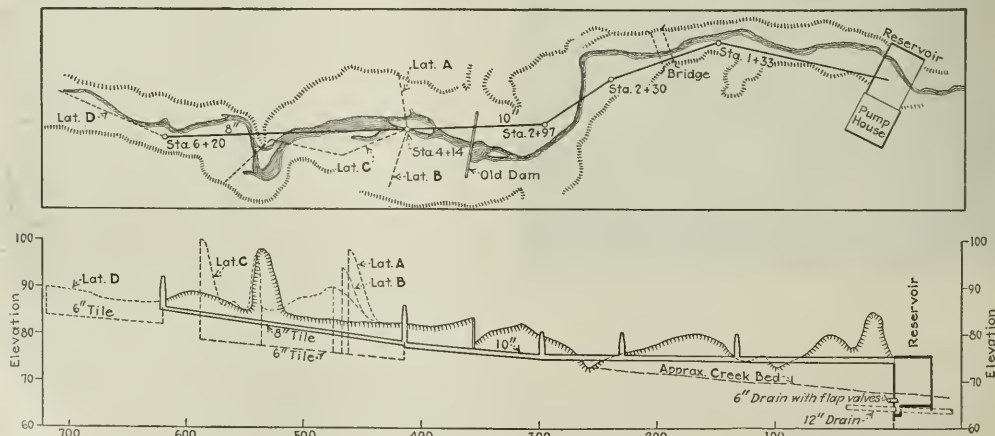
PLAN AND PROFILE SHOWING ARRANGEMENT OF COLLECTION SYSTEM
